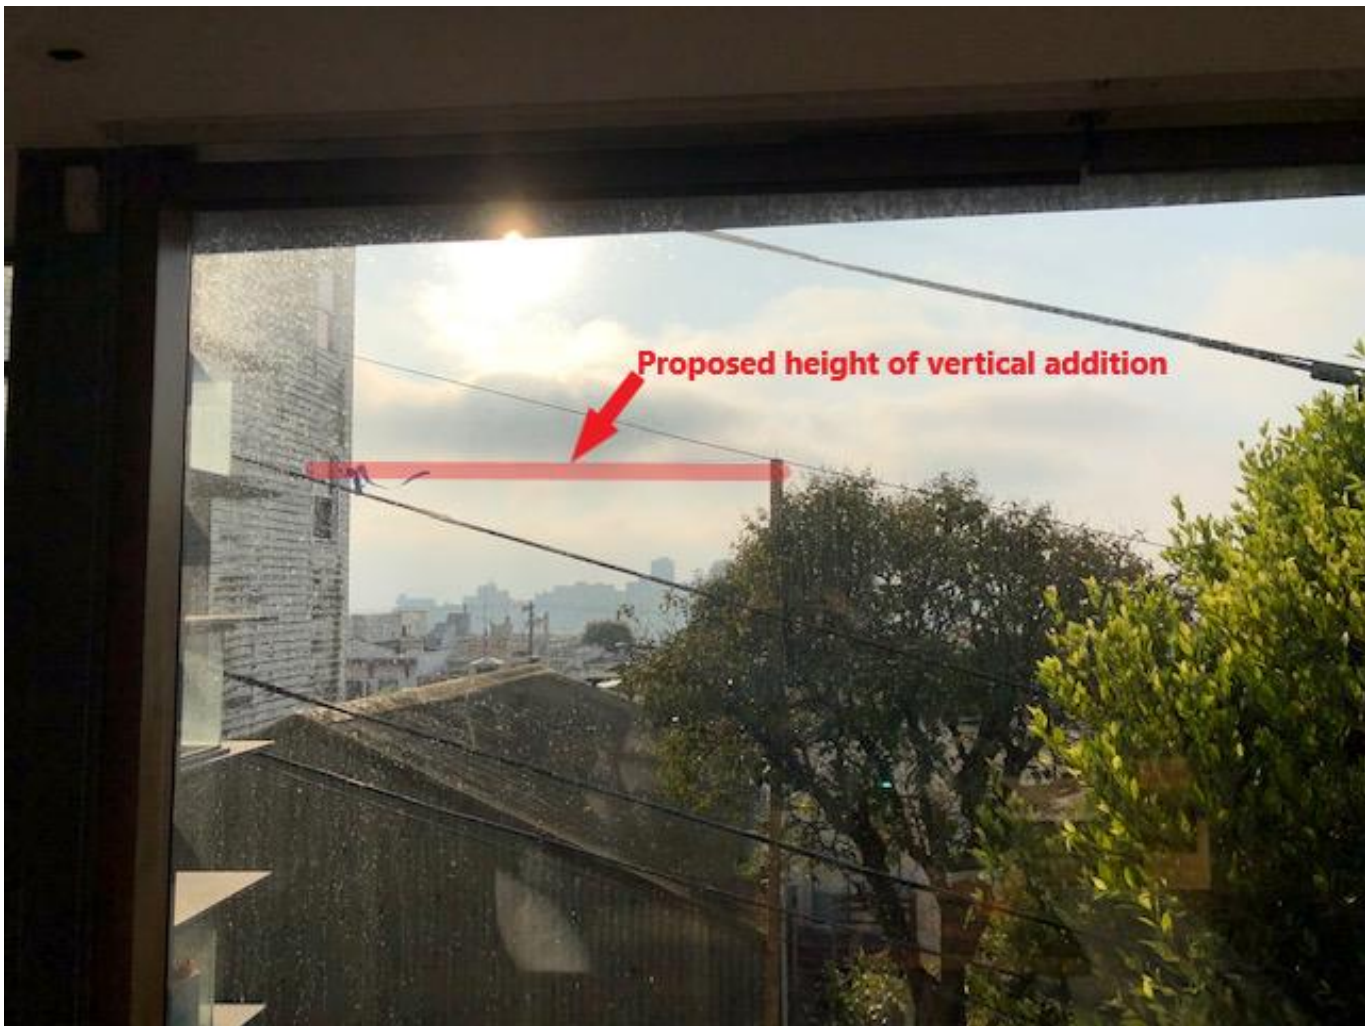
Proposed vertical addition to 17 Reed Street – Photograph from Mr. Stone’s Living Room
